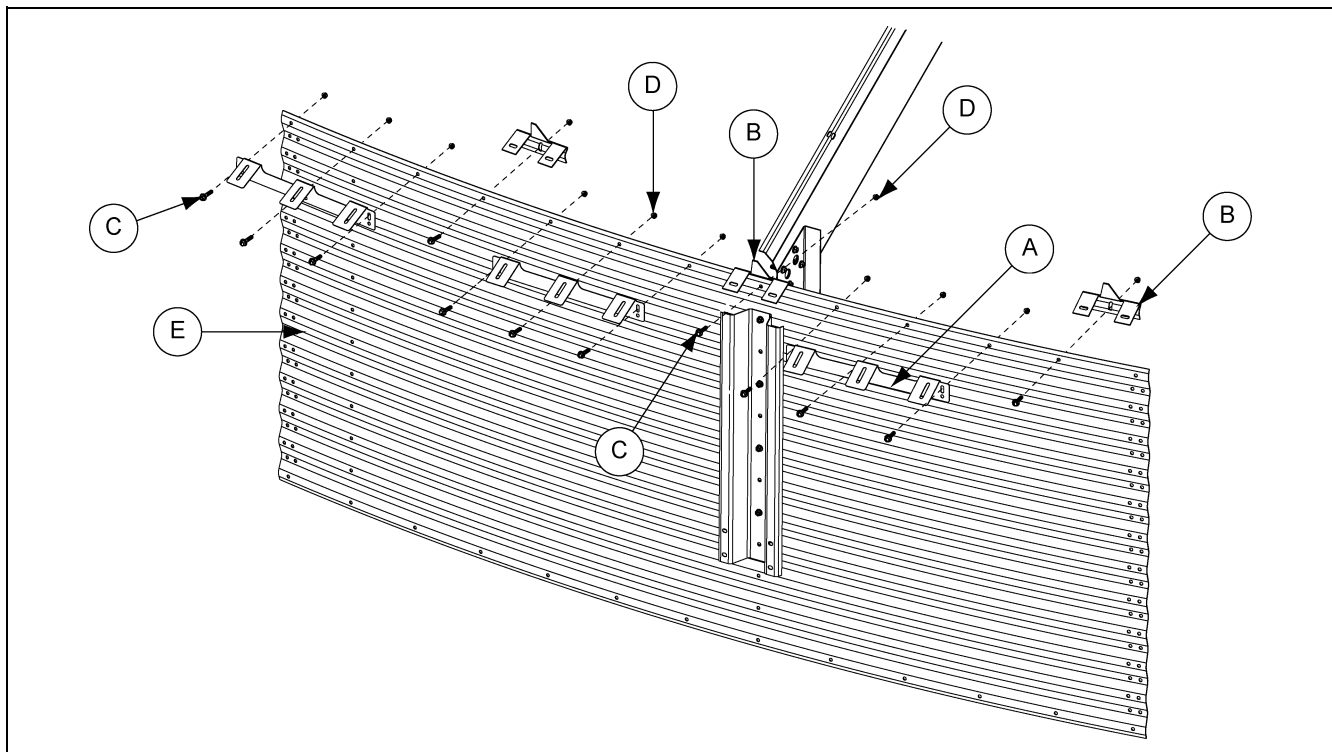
D Installing the Eave Clip and Intermediate Eave Angle to the Sidewall Sheet for 4.00"
